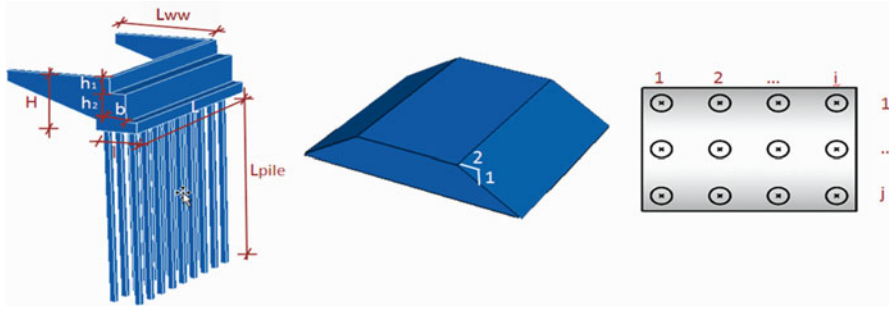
Configuration of a typical seat type abutment-embankment system studied
